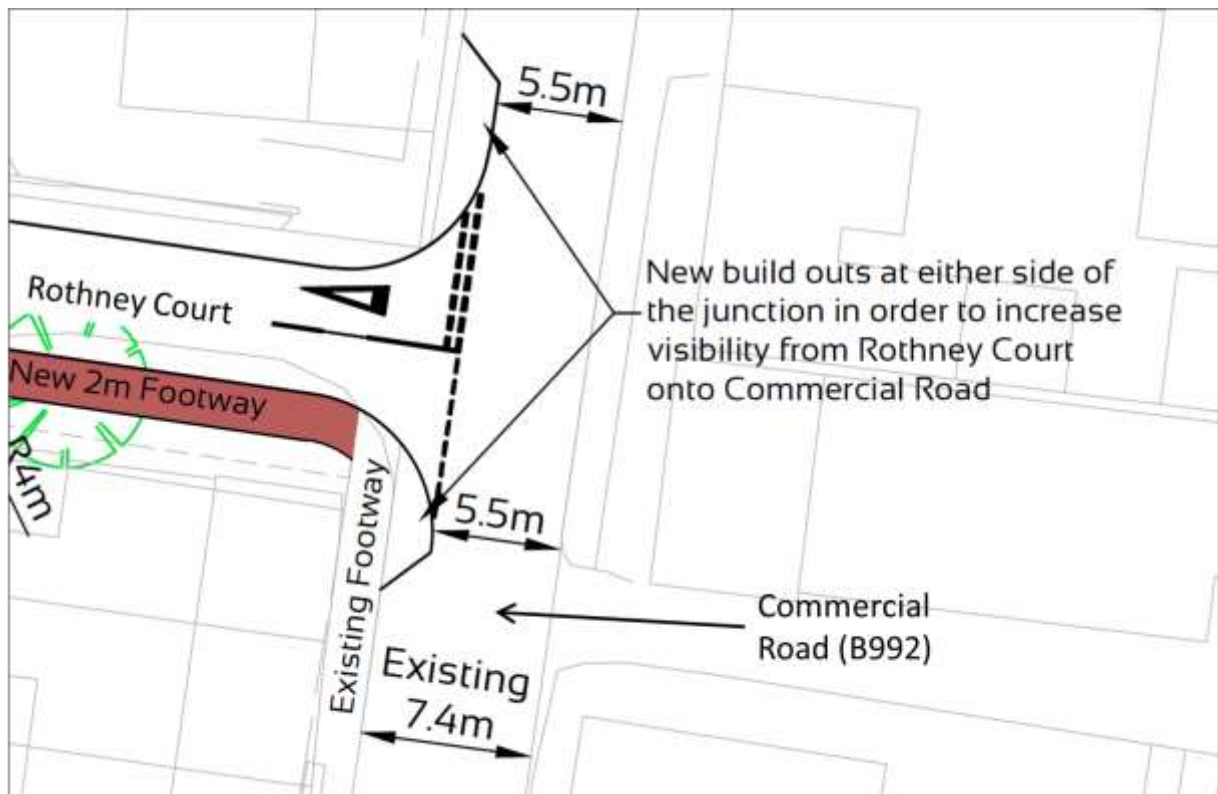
Consented changes to road layout on Commercial Road Insch (B992) as required by planning application APP/2015/0634
